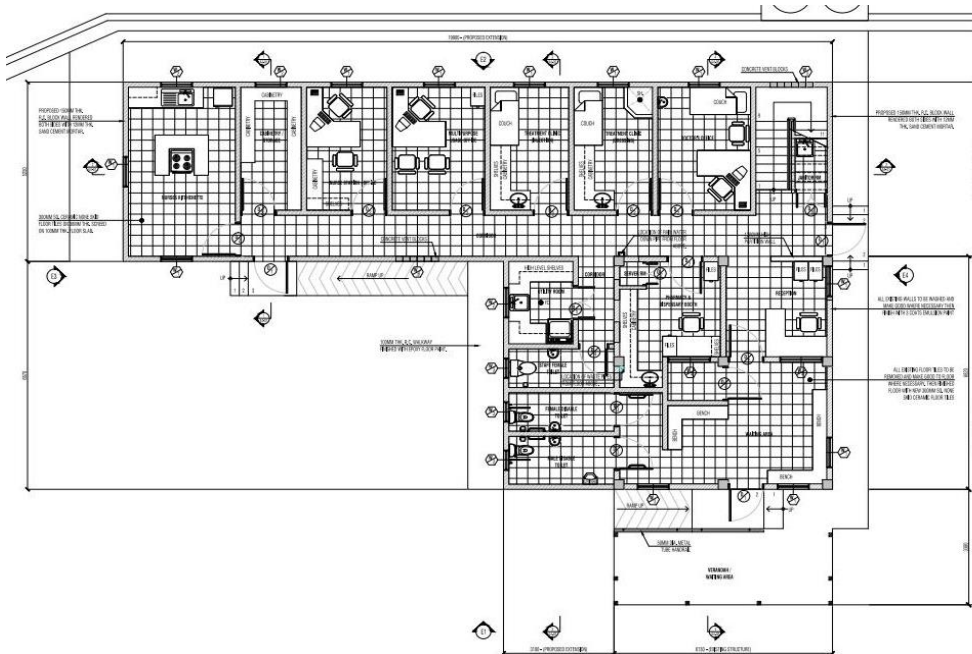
Proposed Ground Floor Layout (Source: compiled by author)
